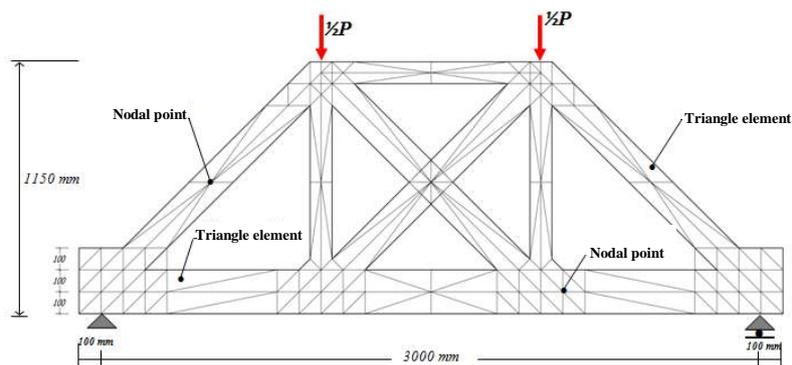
Discretization of the bamboo-reinforced concrete bridge frames.
